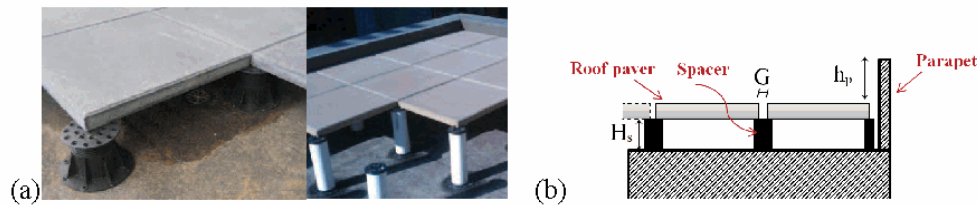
a) Roof pavers on flat roofs; b) Geometrical parameter definition
